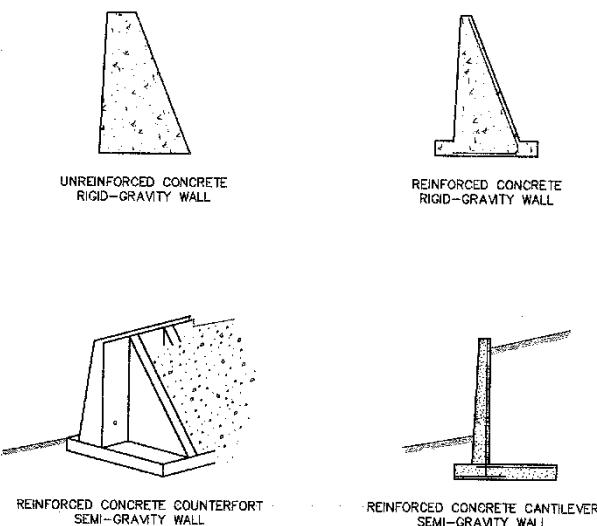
Typical Rigid Gravity and Semigravity Walls
